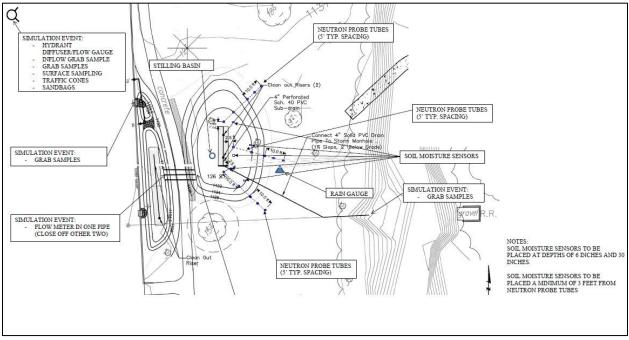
A. Site plan for Orchard Park bioretention system monitoring equipment.
